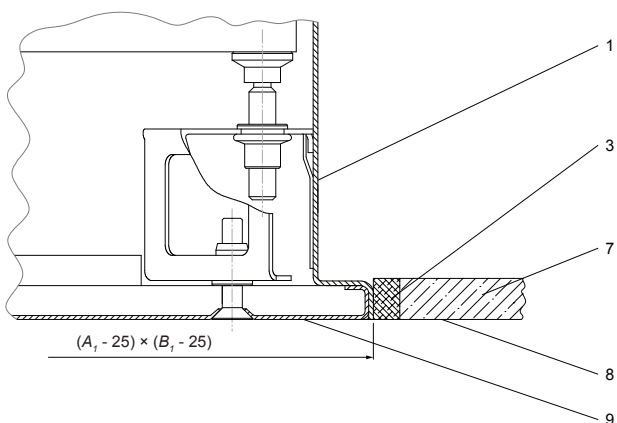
Mounting of the clean filtering cassettes with the type 2 front panel fitting surface into a suspension plasterboard ceiling.
